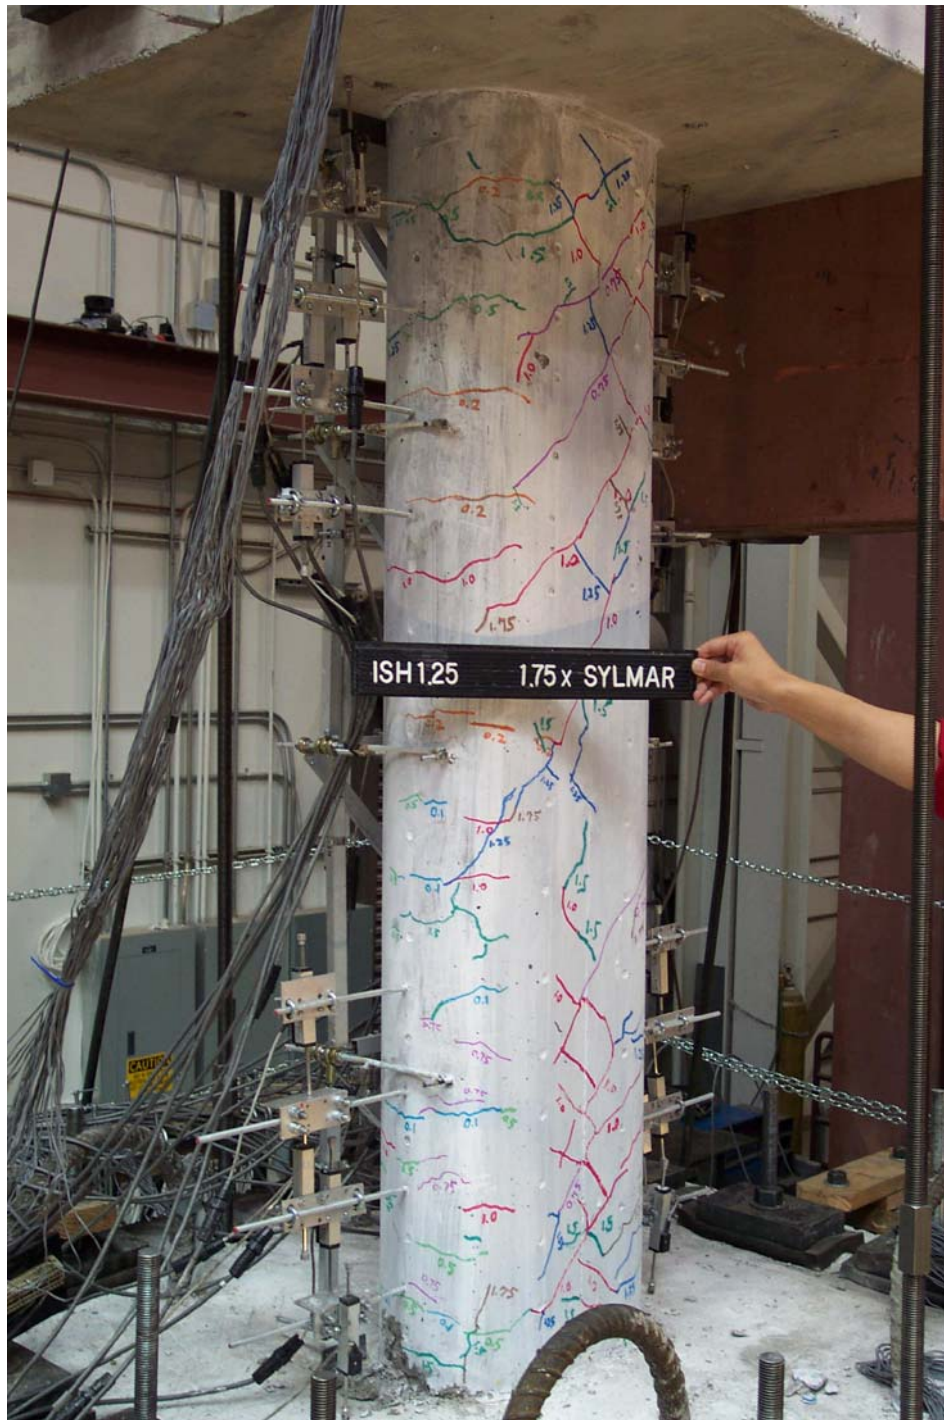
Increasing of Flexural, Shear Crack and Spalling ($\mu_d = 2.2$) Specimen ISH1.25
